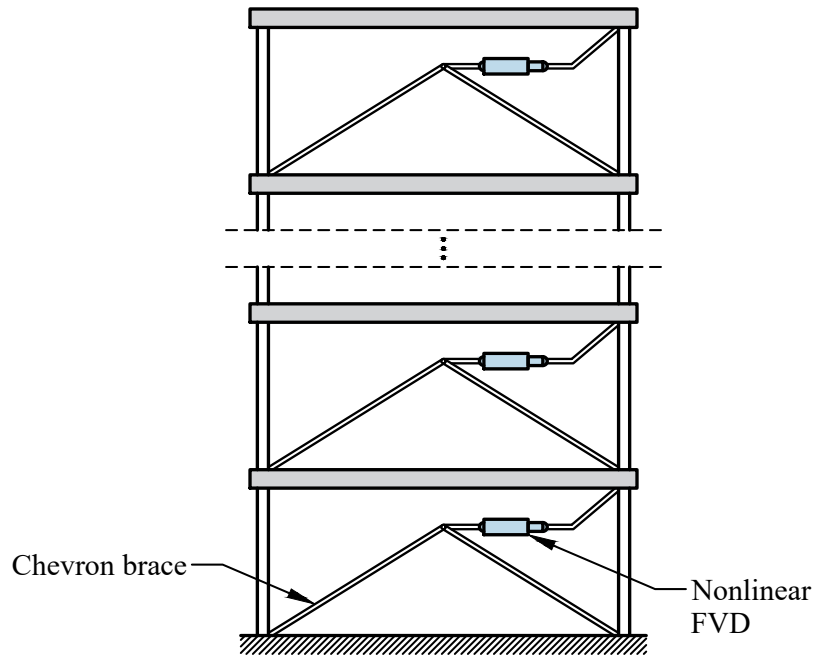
A multi-story building equipped with multiple nonlinear damper-brace systems.
